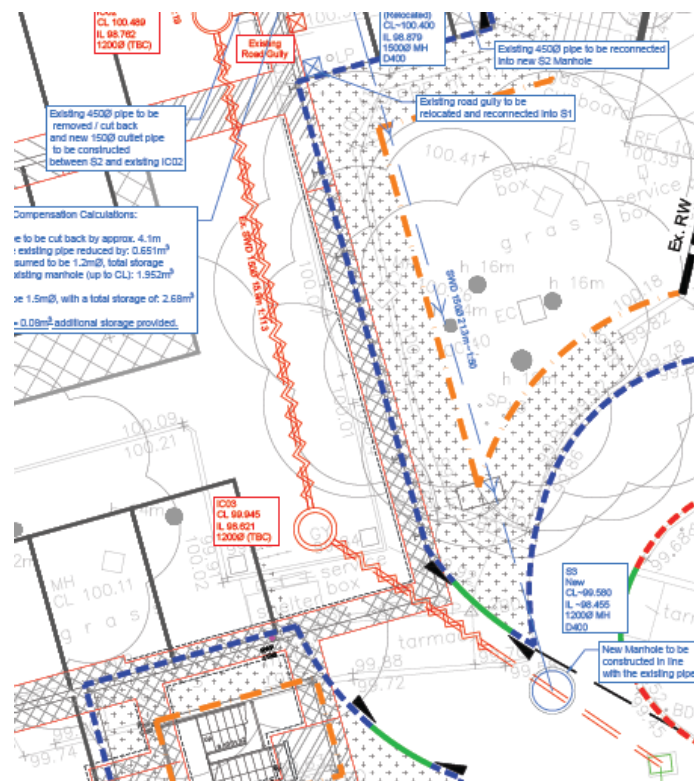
Proposed Drainage (drg. 9101) extract – Remaining Diversion Part
